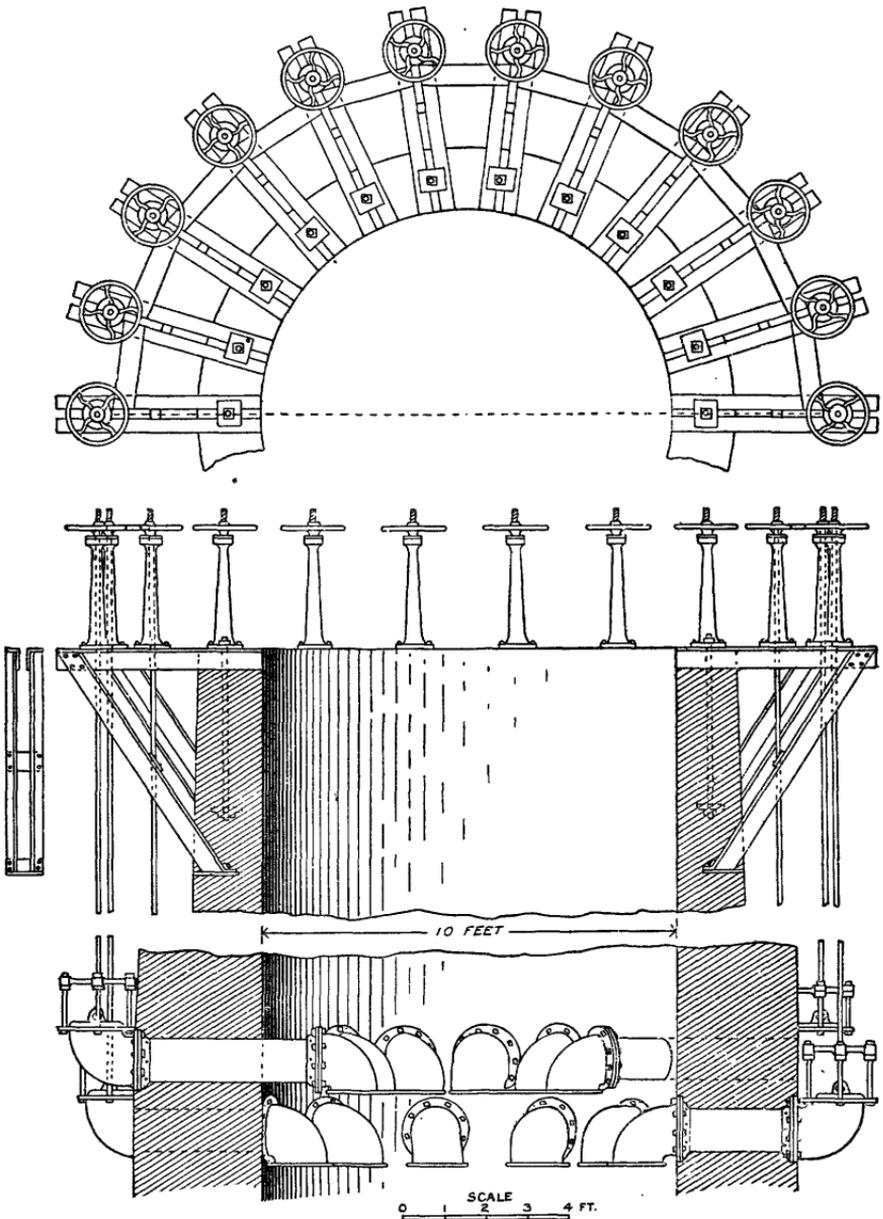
Vertical section of tower for dam proposed by Kern-Rand Electric Power Company, showing arrangement of gates.
